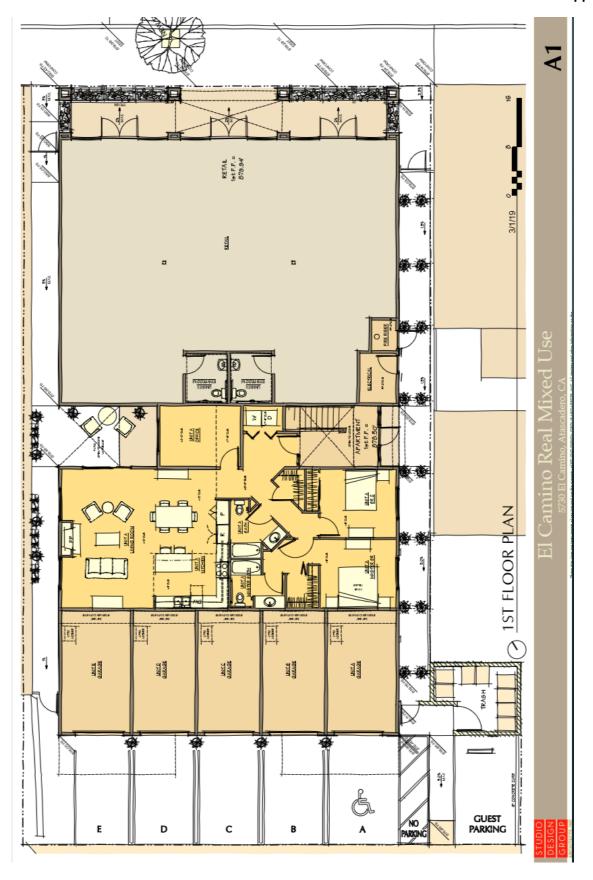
EXHIBIT C: Site Plan, Floor Plans, and Elevations
